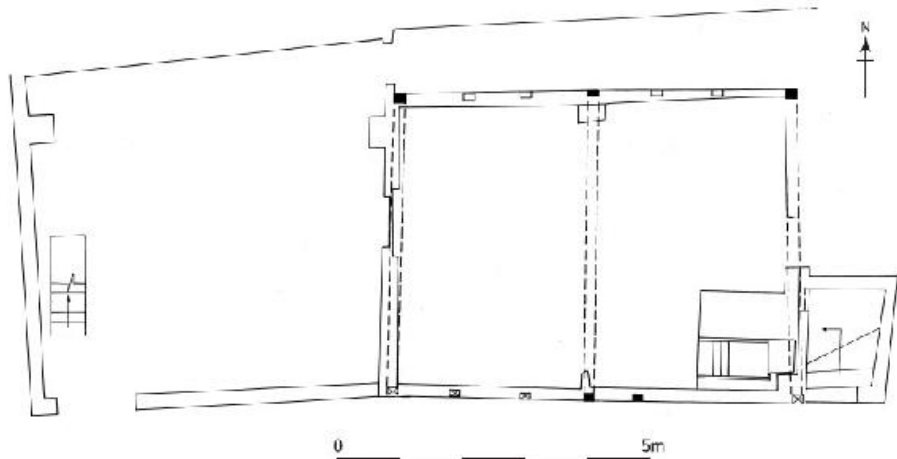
Ground-floor plan of the two-bay former cross-wing at 41a Bridge Street
